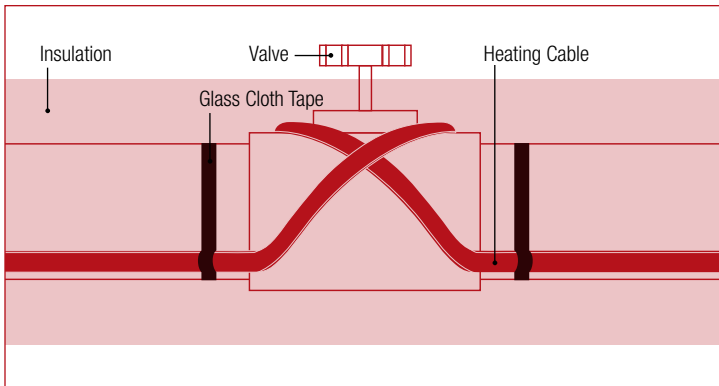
Securing Heating Cable to Pipe Valves and Gauges
